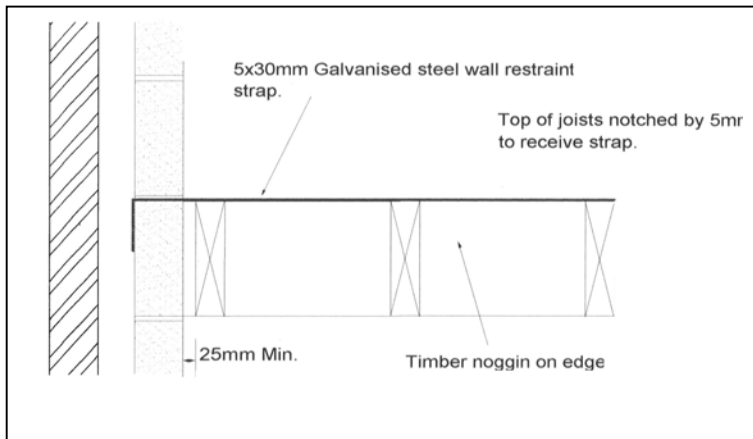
Wall Restraint Strap Detail for Solid Timber Joists.
